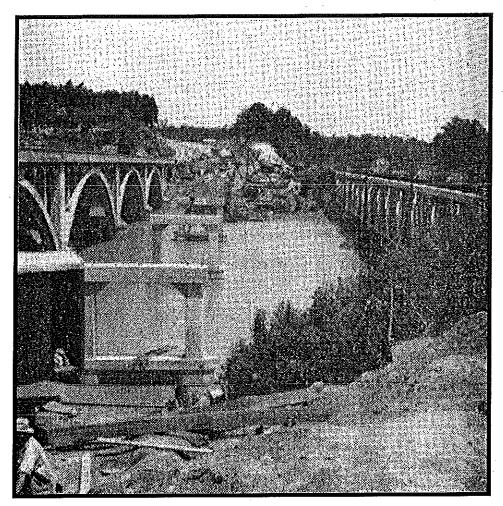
1953 photograph of the piers of the new US 29/70 Bridge; note Wilcox Bridge at left and North Carolina Railroad bridge at right (source—North Carolina Roadways January/February 1953).
